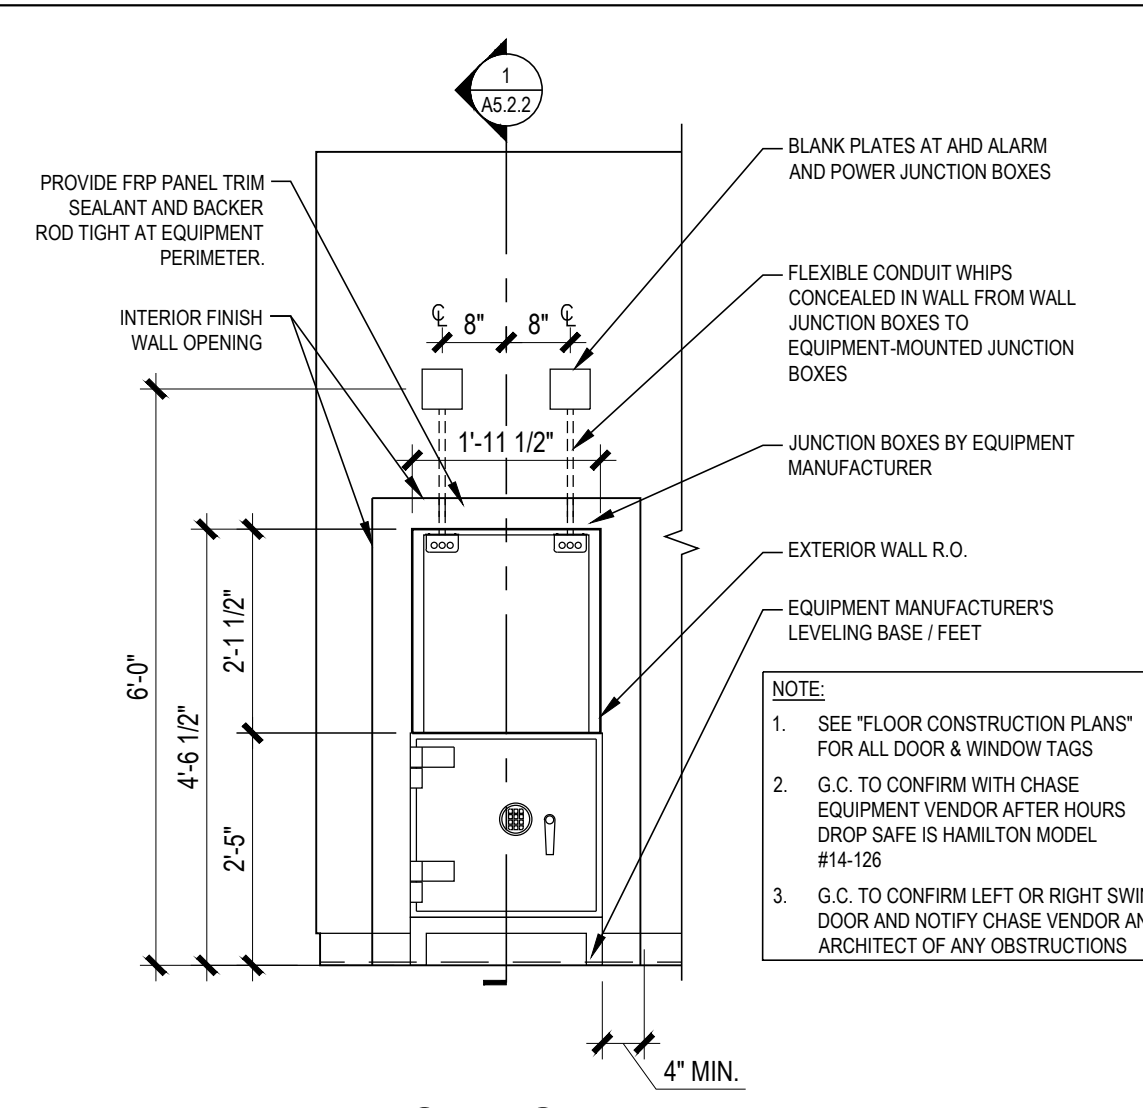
DETAILS: WALL OPENINGS & INTERIOR DETAILS
